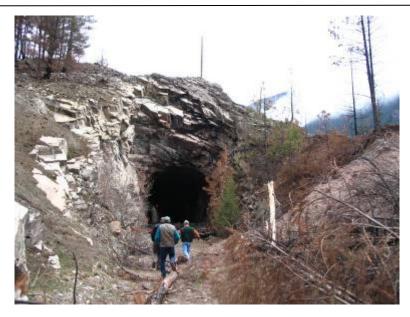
West portal of Tunnel No. 18 on the Milwaukee Road Railroad grade. View to the east.
